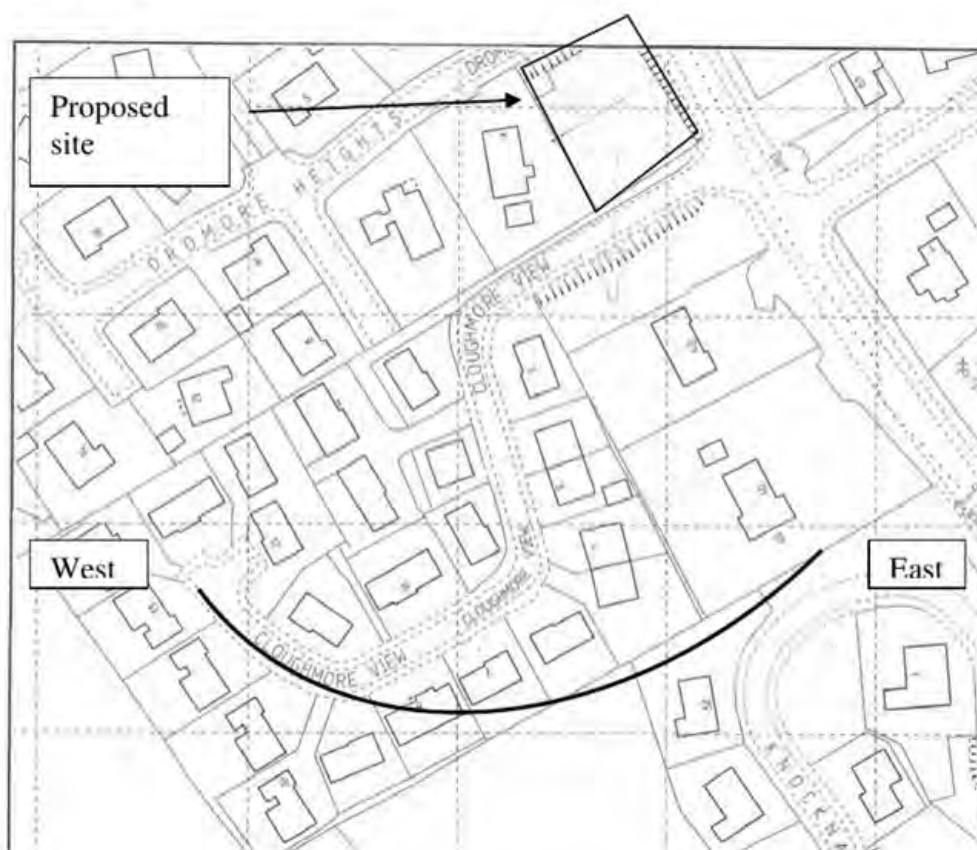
Site plan showing separation distance of 13m between dwellings. Closed boarded fence will be approx 2.8m high from Cloughmore View site to Dromore Heights site.
